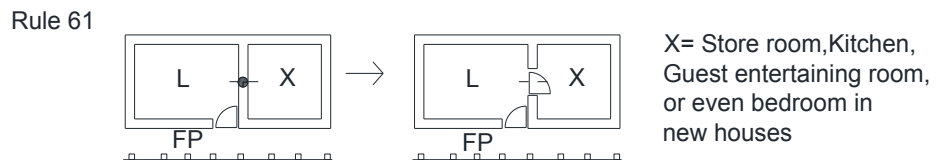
Rule for definition of internal doors connecting two rooms from inside of the living room.
